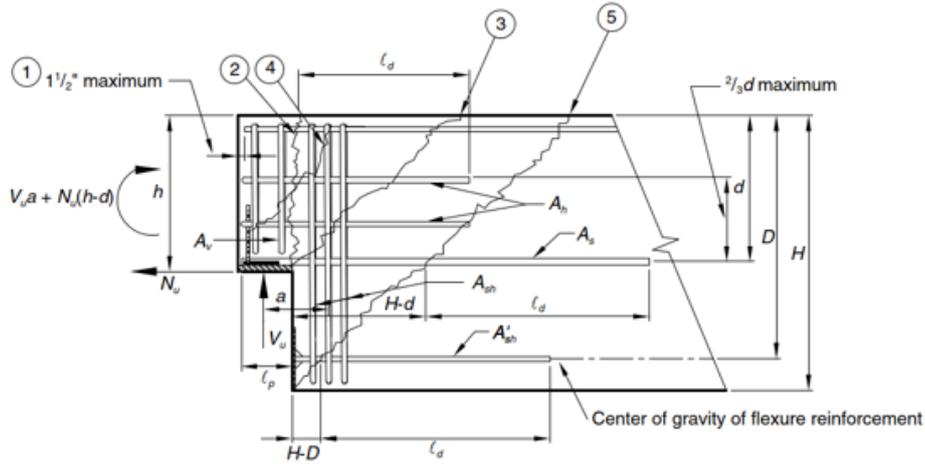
Reinforcement and crack formation in a dapped end connection [29]
